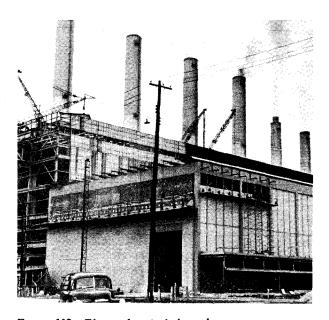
The south end of the turbogenerator room was constructed of brick and glass block laid from a swinging scaffold suspended from cantilever beams on the roof.
